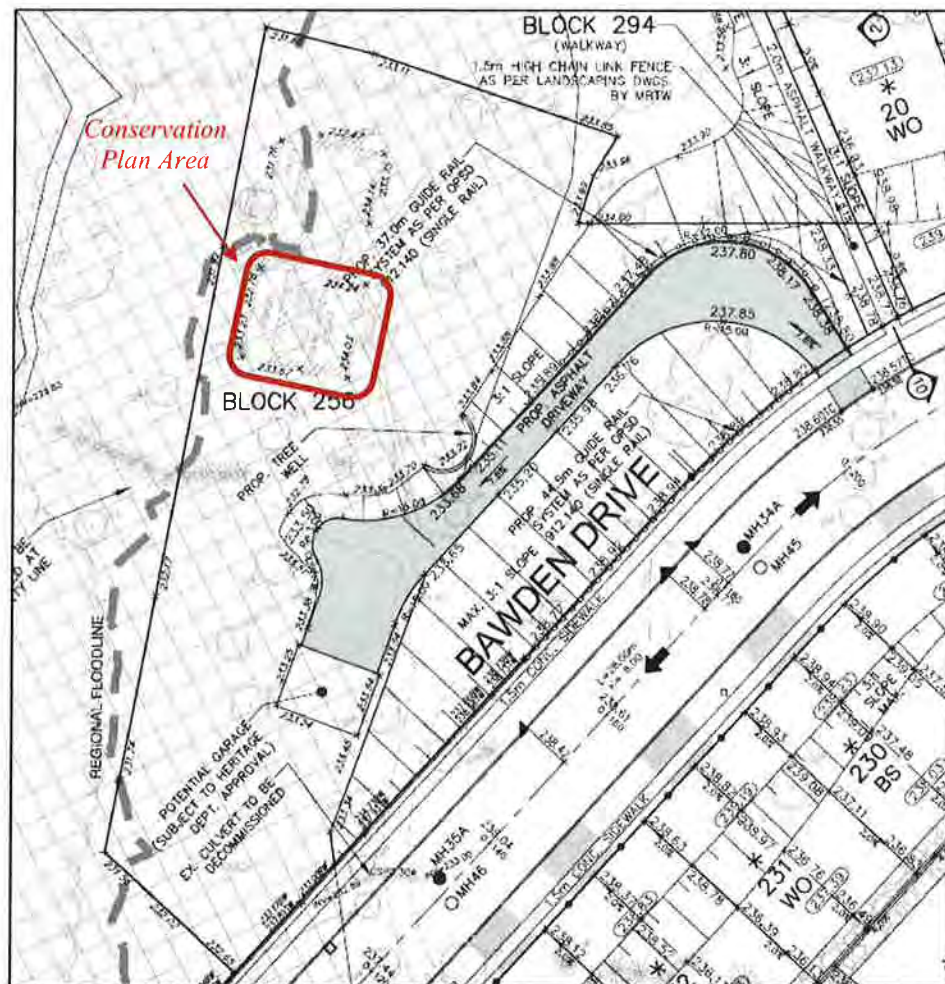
Conservation Plan Context Source: Part of L10-298 Base Grading
